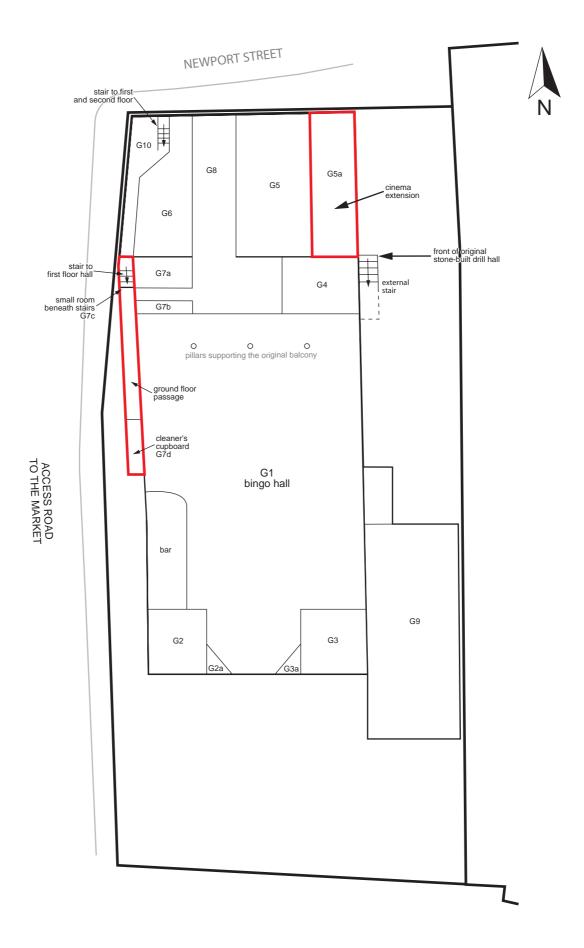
The Electric Bingo Hall, ground floor plan (nb. not to scale - based on field observations). Areas outlined in RED are extensions added to the building when it became a cinema.
